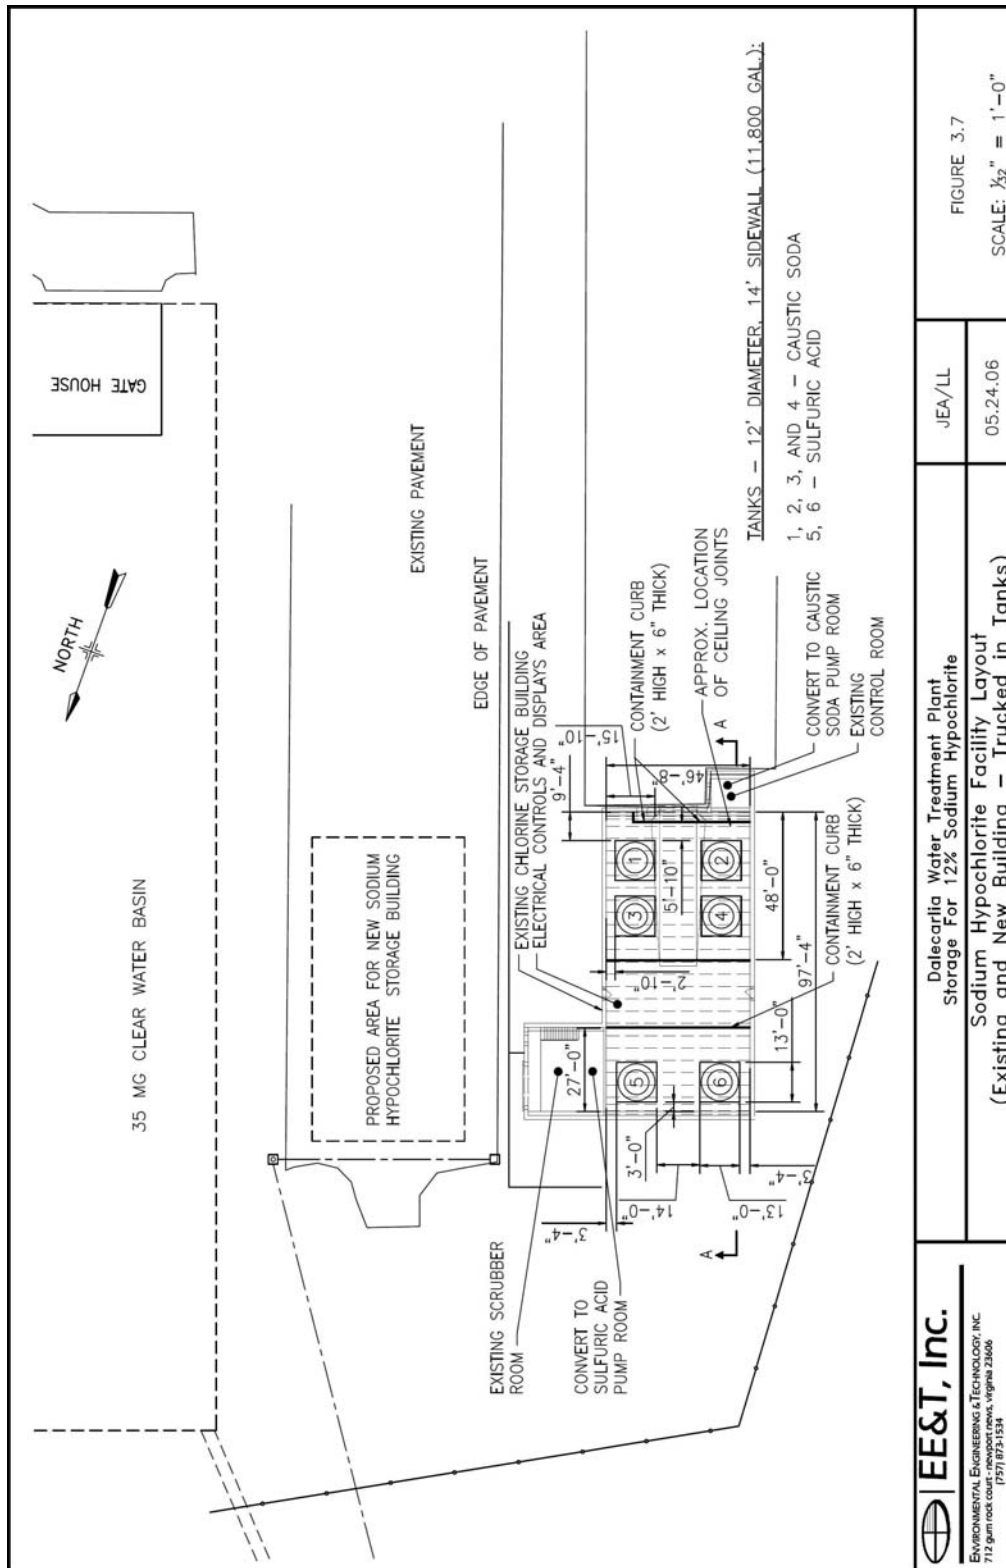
Plan view, Dalecarlia WTP, caustic soda and sulfuric acid storage in existing chlorine building
